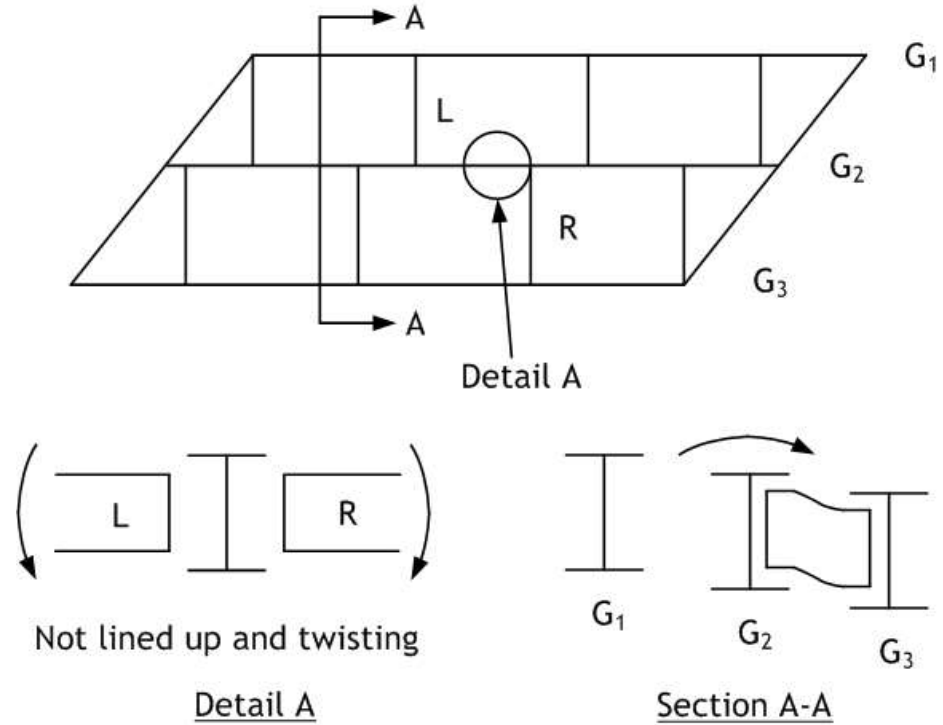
Skewed Bridge Producing Out-of-Plane Bending due to Differential Deflection of Floorbeams and Girders
